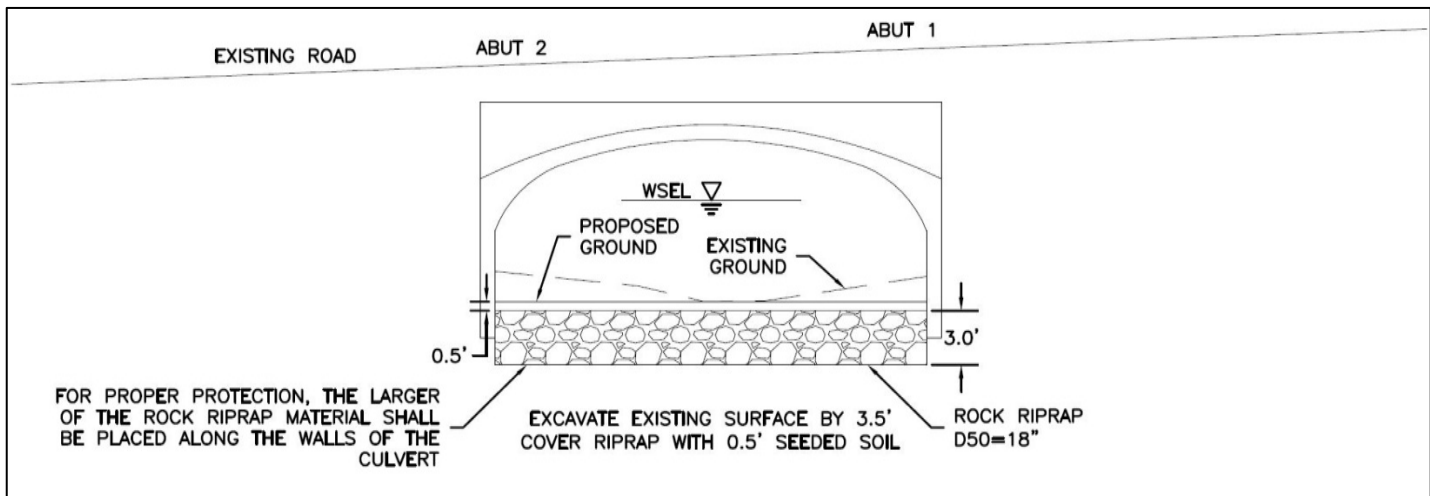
Cross-sectional view of Bridge G-11-C with recommended hydraulic scour countermeasures
